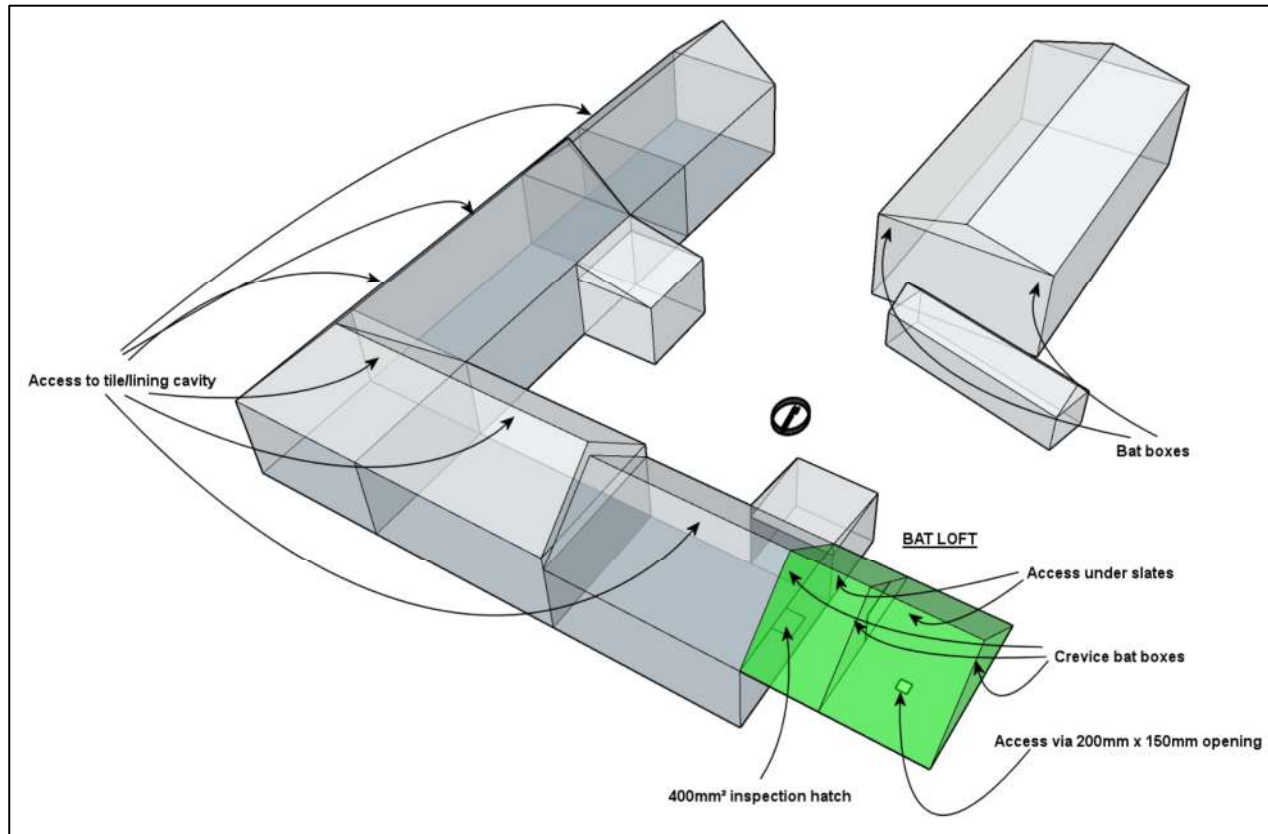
Rough proposed plan of the site showing the location of the proposed bat roosting features
